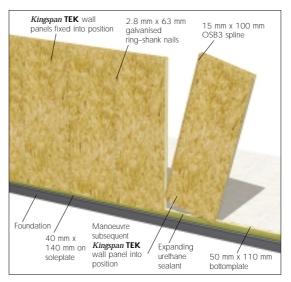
ERECTION OF SUBSEQUENT WALL PANELS
